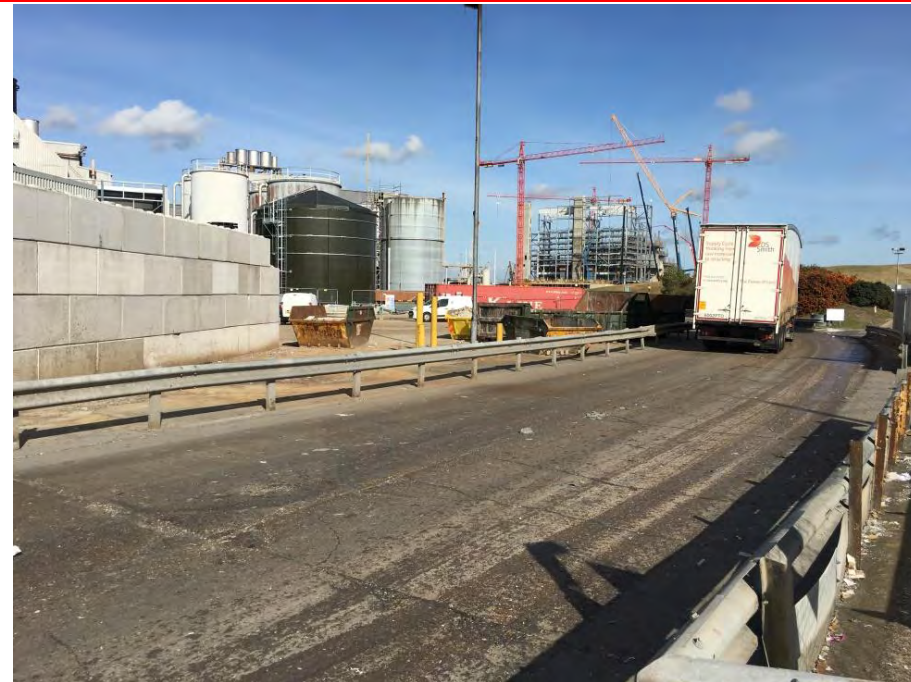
View of staining across the vehicle weigh bridge in the centre of the Proposed Development site (facing north).
